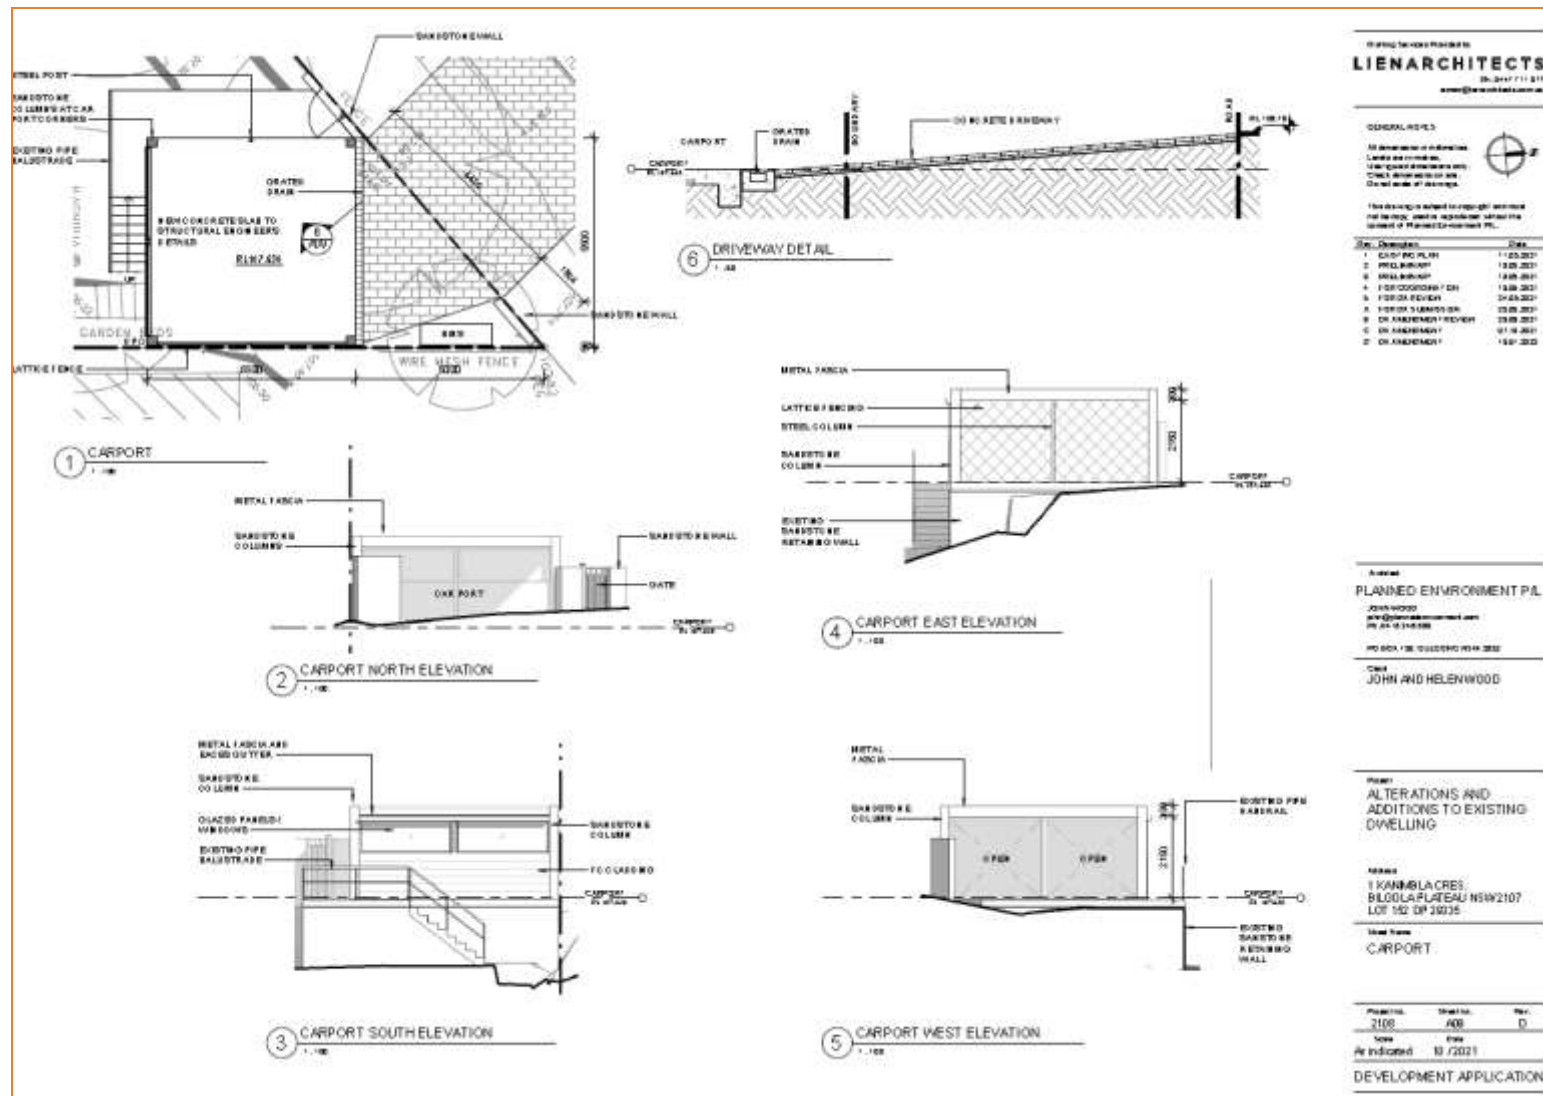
Illustrates the as proposed UPDATED DESIGN CONCEPT: Pages 9 thru 12: Site Plan/Elevations/Carport /Driveway Plan/Elevations.
